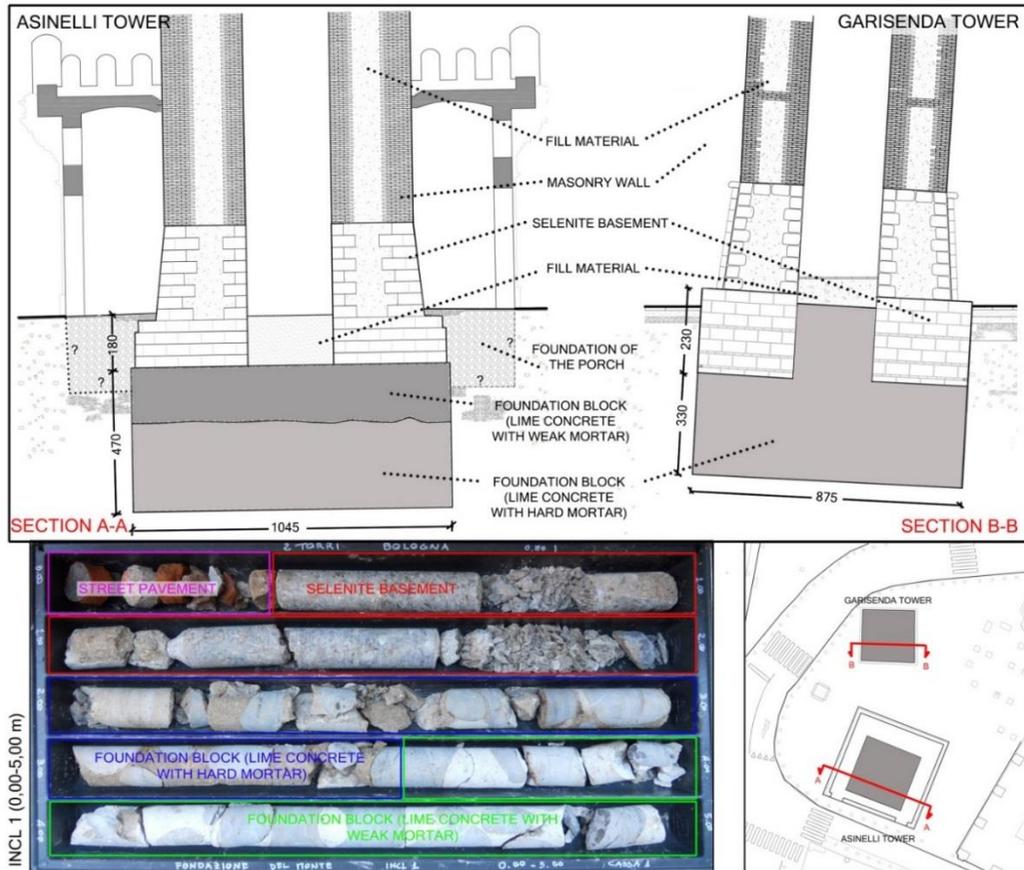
Schematic sections of the towers foundations (top) and picture of cores extracted from one of the two inclined boreholes executed on the Asinelli foundation (bottom, left).
